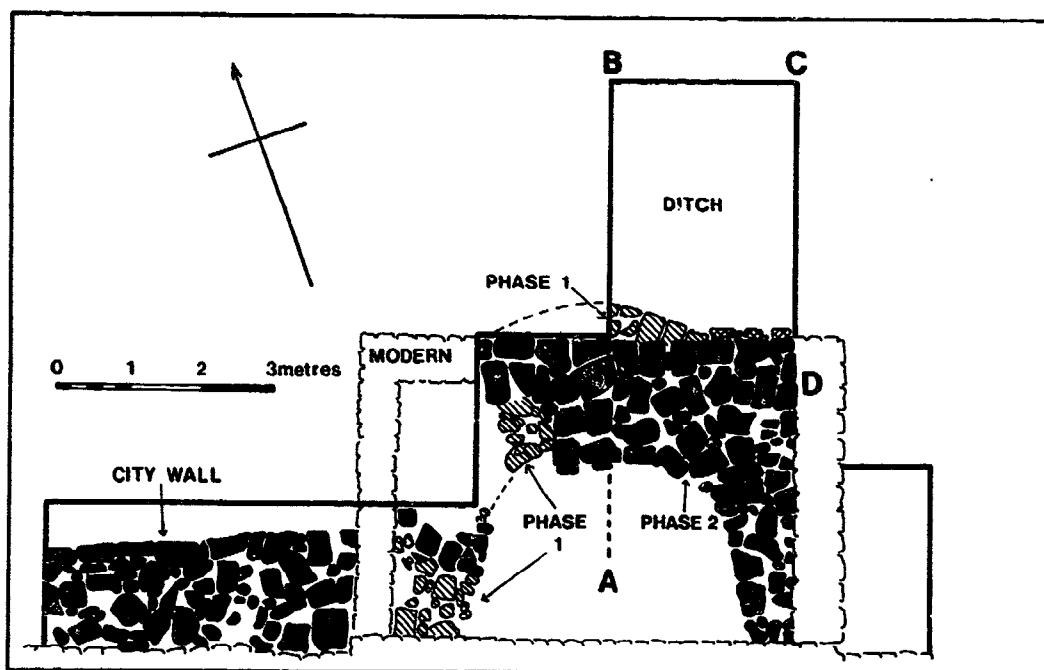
Bastion 10a. Plan. For the positions of the sections see fig 118:M3.E12
